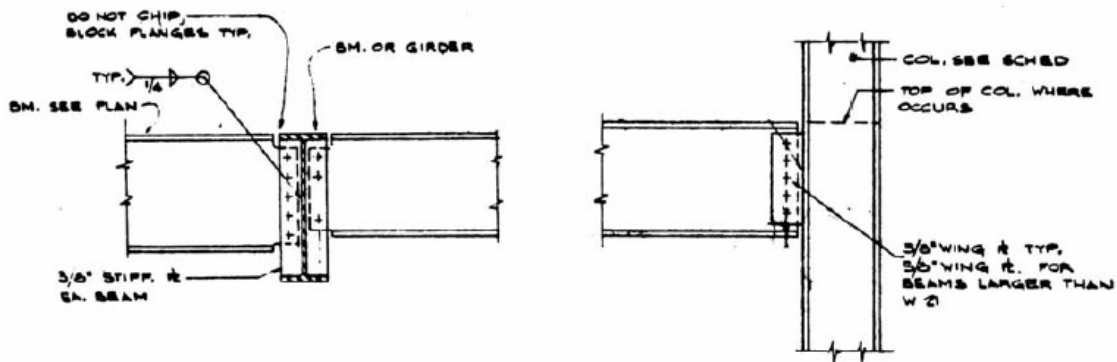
Non-Moment Beam-Girder and Beam-Column Connections ($d_b < 24''$)
